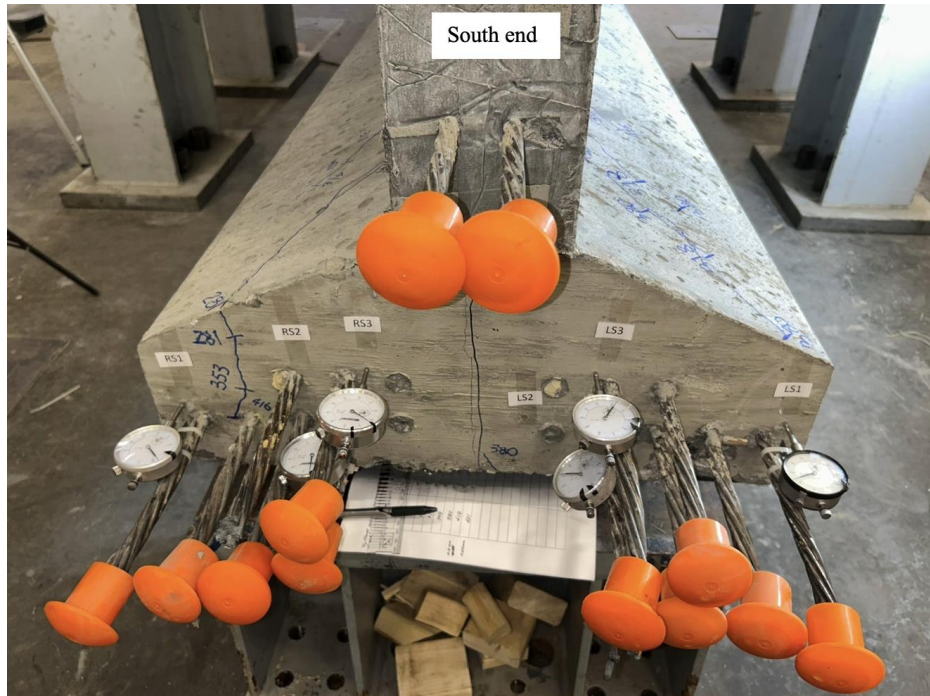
Photo. Test 2.2.S (repair 2.2LTF) south end cross-section vertical cracks at 431 kip.
